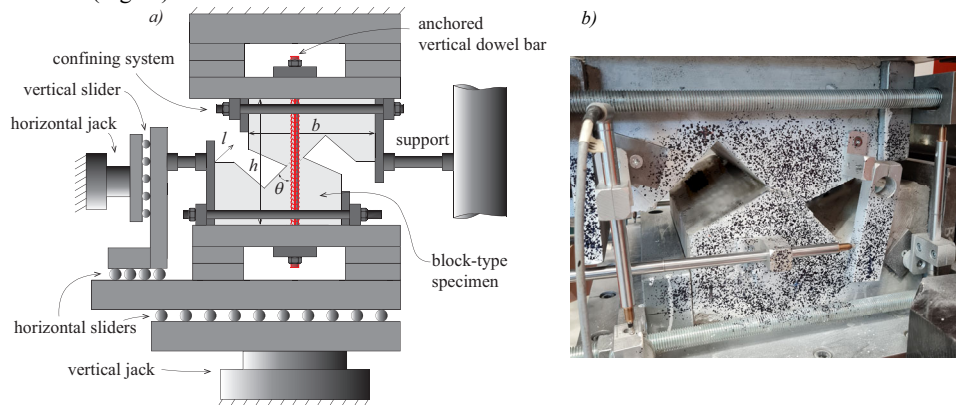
Test set-up: (a) front side of a specimen and (b) photo of back side of a specimen with speckled pattern for 3D DIC measurement.
